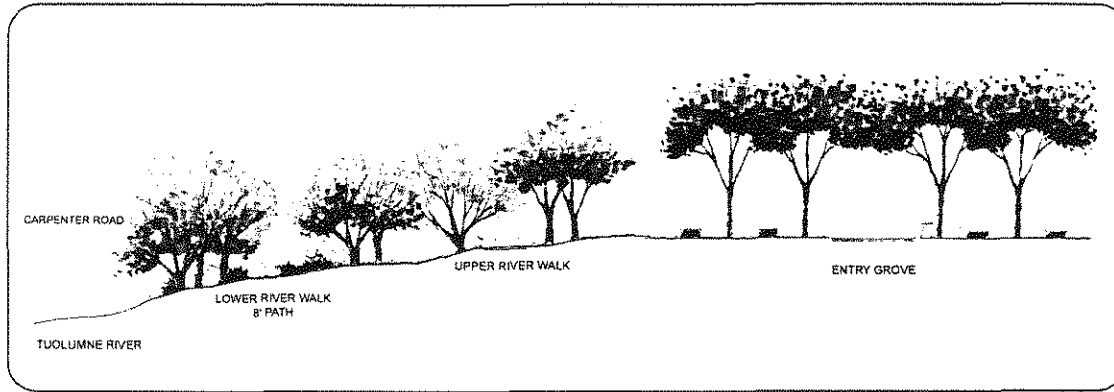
Carpenter Road Area - Illustrative Cross Section A
